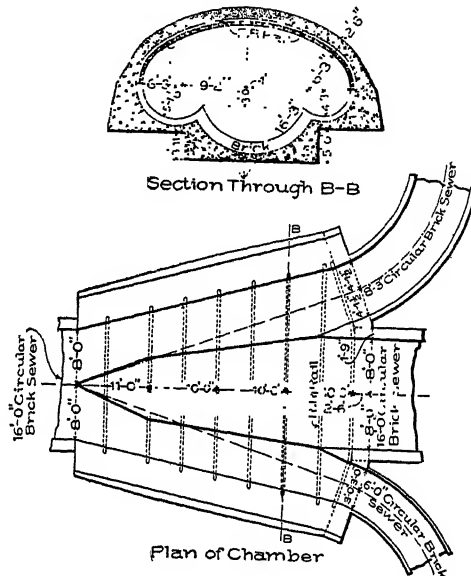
Junction of Brick Sewers, Lawrence and Sheridan Avenues, Chicago, Ill.
